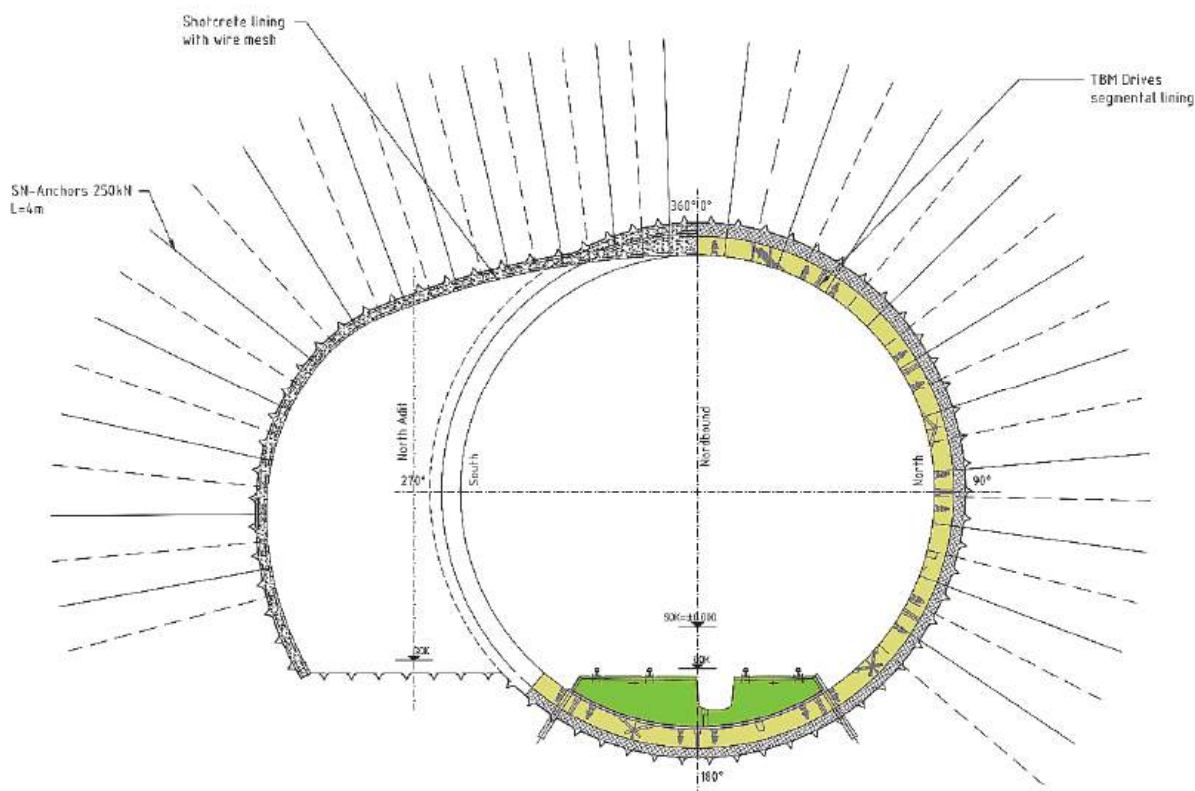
Excavation and support at the intersection of access tunnel with main tube (TBM-tunnel).
